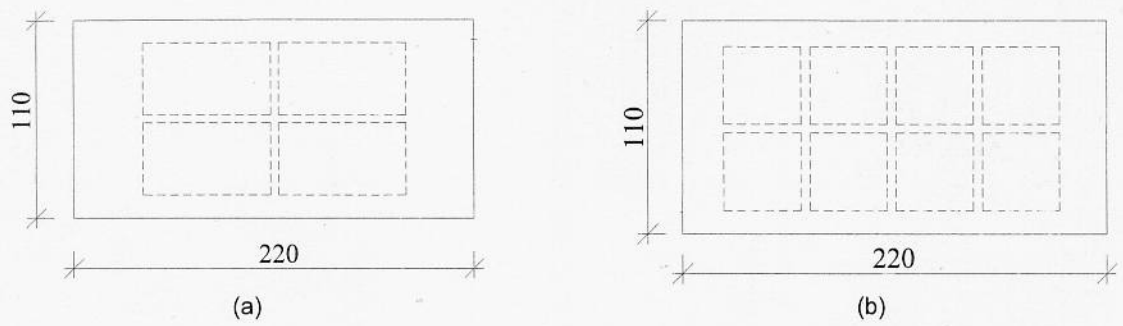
Solid bricks: (a) SH specimens; SV specimens
